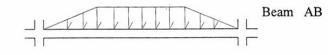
Trapezoidal distributed load for Beam AB of Fig. 2-16.
